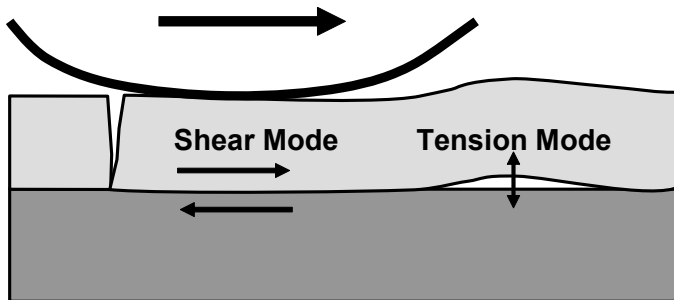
Adhesion stress modes in the upper pavement layers under service conditions
